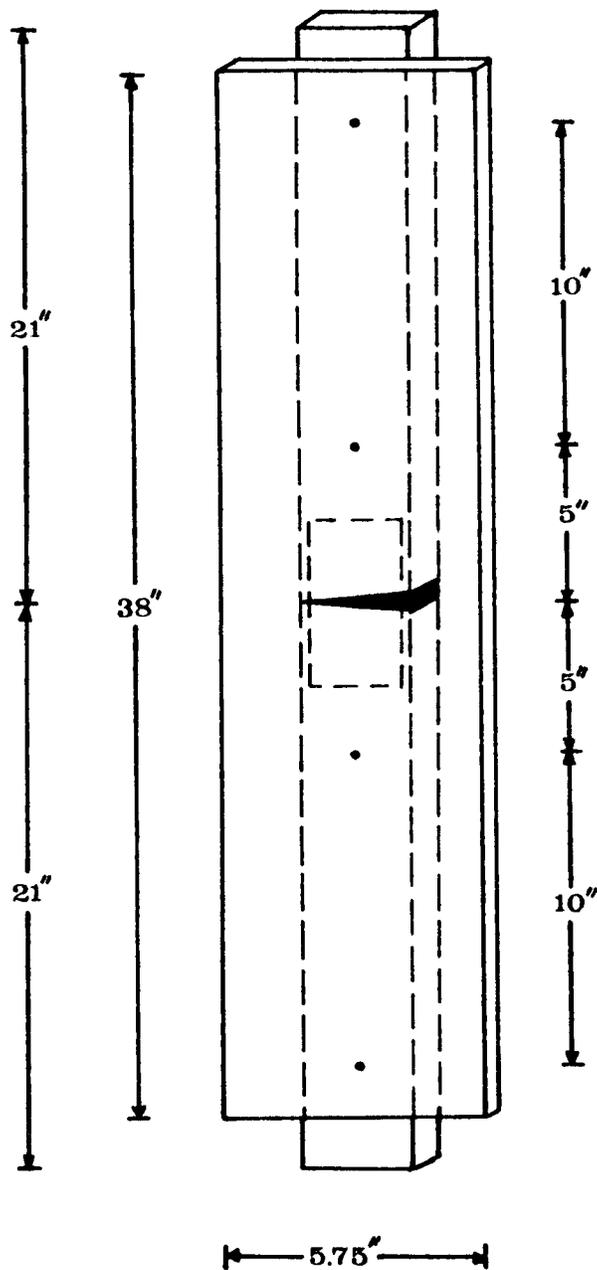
Floor truss joint specimen. Gap is exaggerated for clarity.
